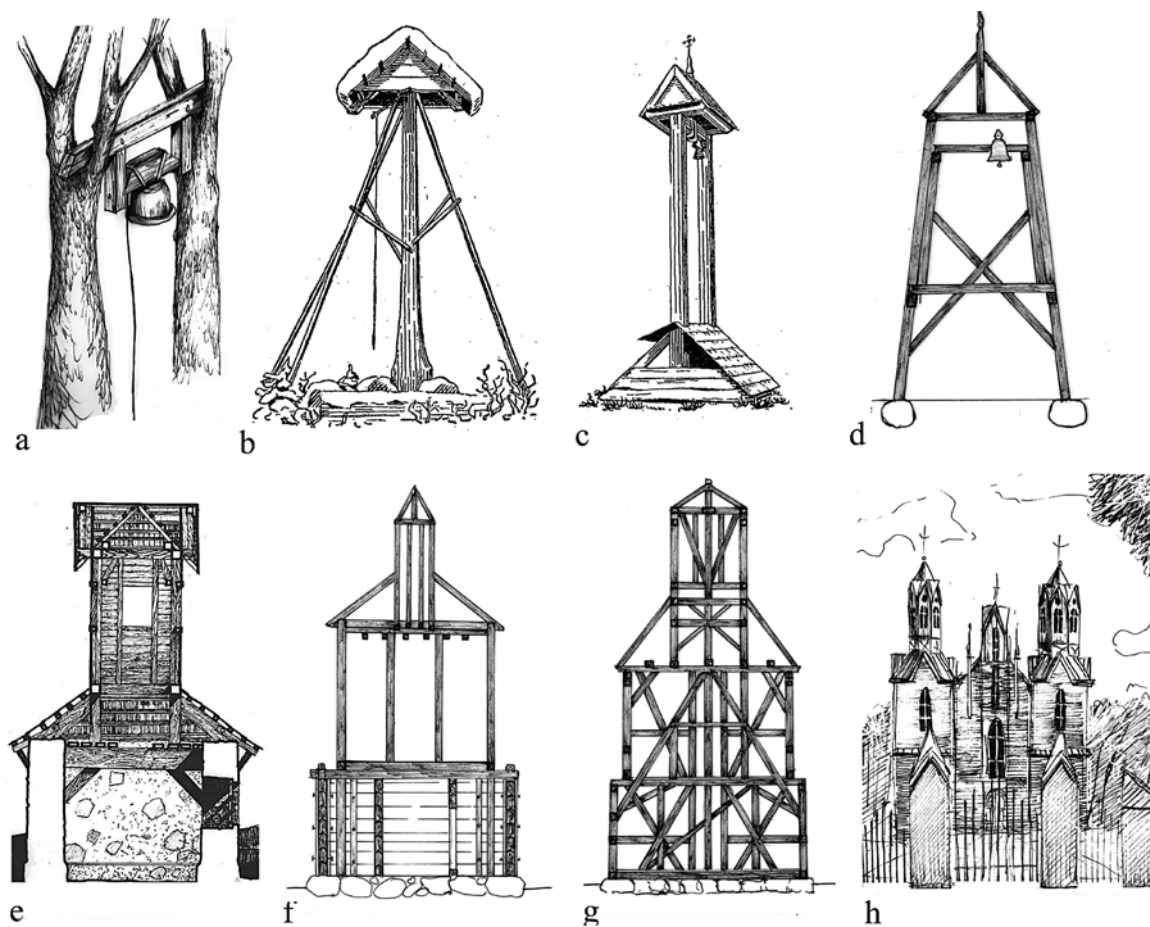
Types of bell towers: a) bell, hanging between two trees; b) bell tower realized with wooden oblique or crossed planks; c) belfry, made by two trunks fixed to the ground; d) bell tower made with four logs joined together by a frame trellises; e) bell tower built on masonry ground works, adopting the frame system; f) belfry made mixing different systems (Blockbau and frame system); g) tower realized with small roofs with intermediate connections; h) belfry, incorporated into the church (Some sketches are taken from Kauno Technologijos Universitetas archives)
